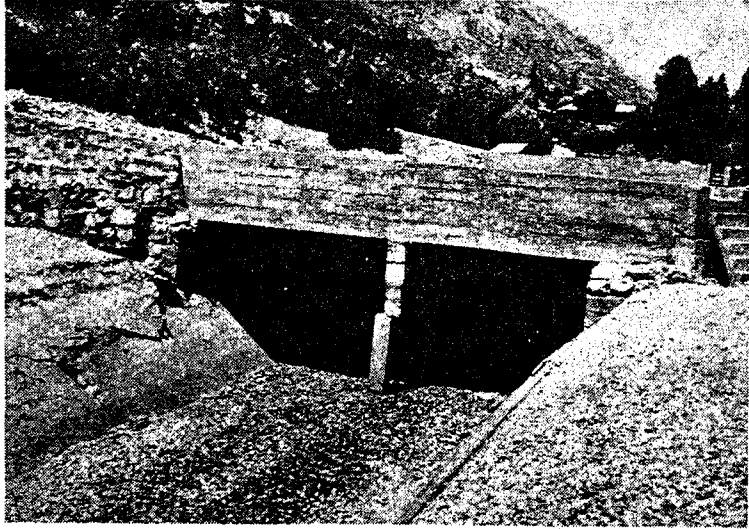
Maipo canal. Passage over the canal. Shear of the column due to the sudden horizontal movement is seen.
